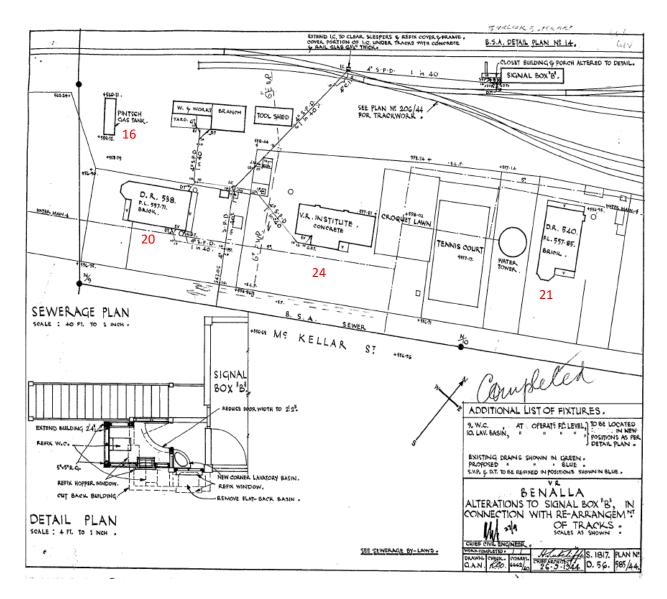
Alterations to Signal Box B in connection with re-arrangement of tracks.
